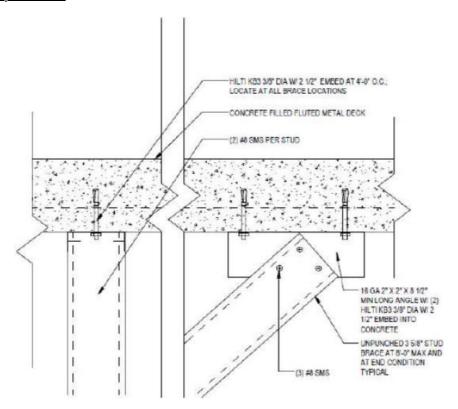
Condition 2: TI ceiling elevation does not match exterior window mullion elevation
